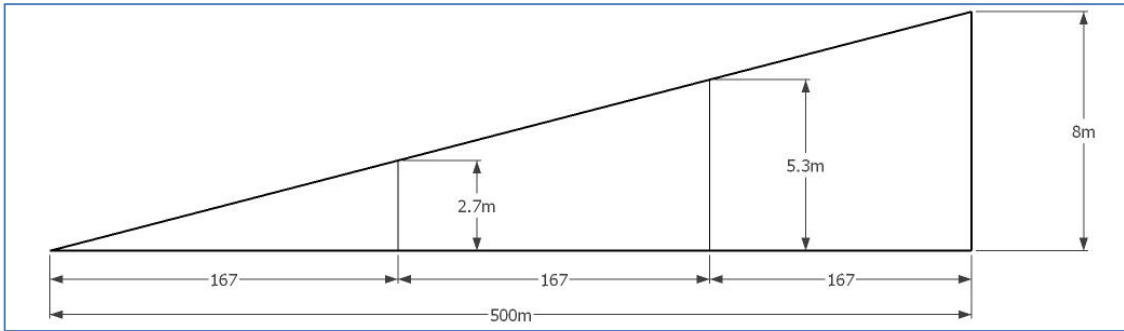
2 Side view of MSE Walls 1, 3, 13, 14 (not in scale)
